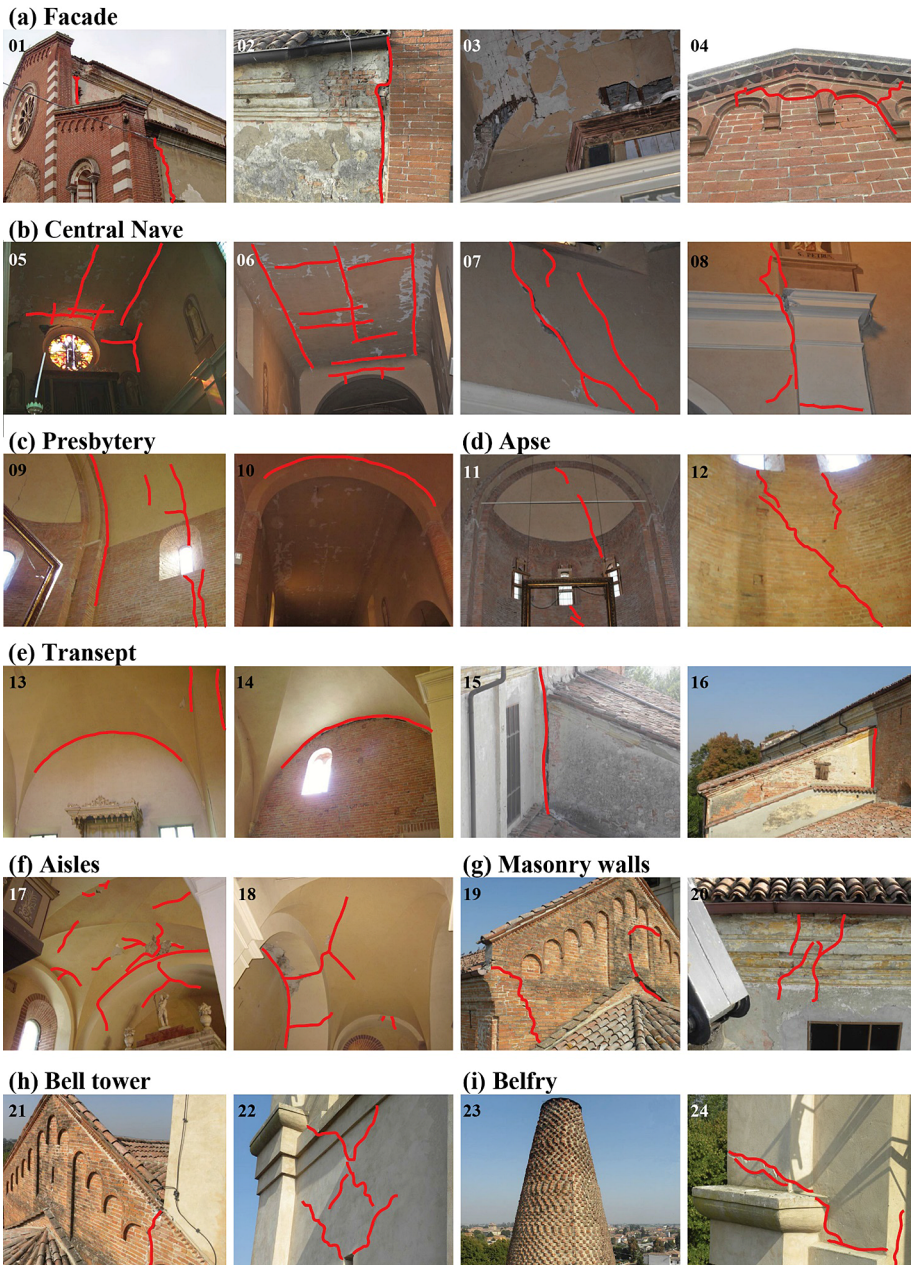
San Benedetto Abate church damage survey: photographic documentation
